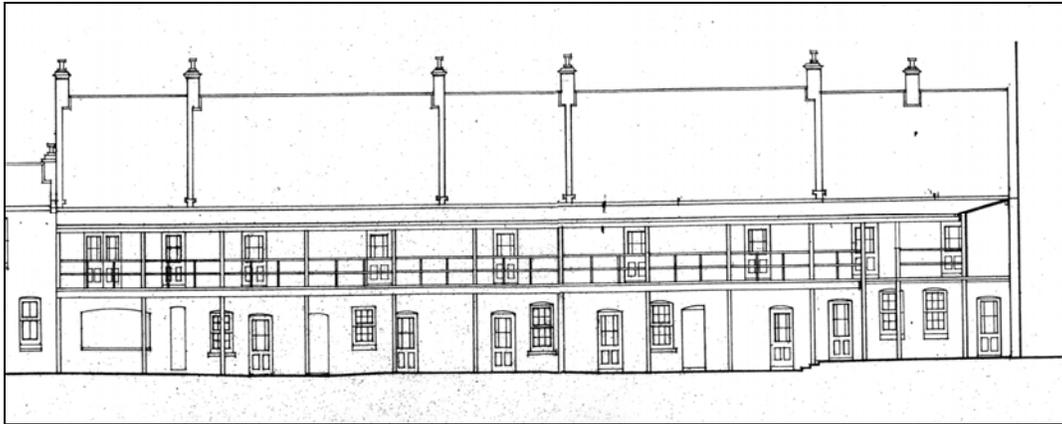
The west elevation prepared by Tropman & Tropman Architects. (Source: Foreshore Authority Archives RE 1199.01.01)
